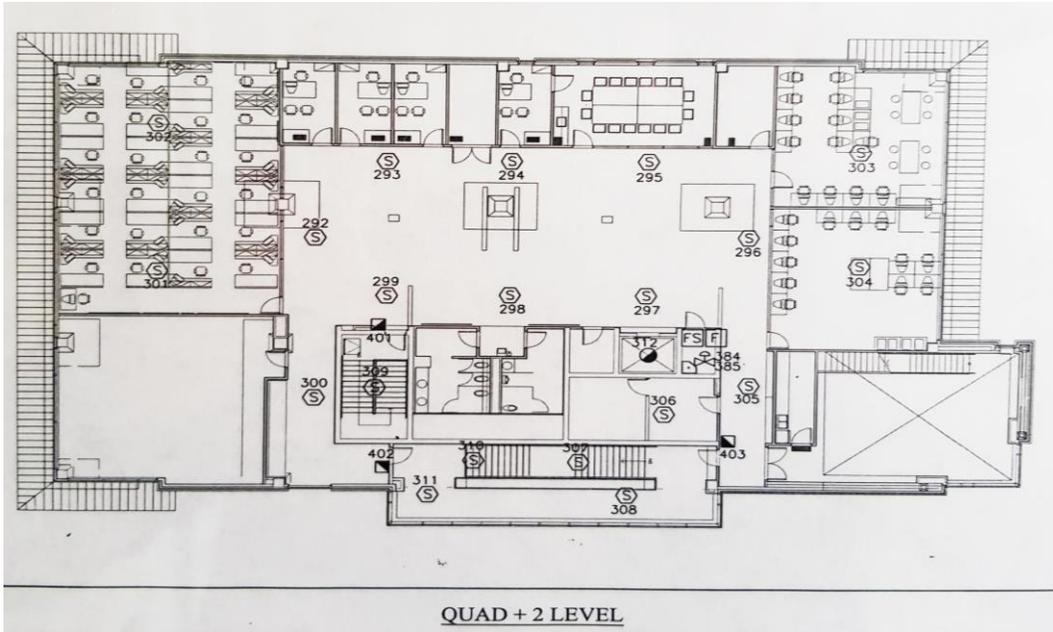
Azrieli School of Architecture and Urbanism fourth floor plan – AP.
